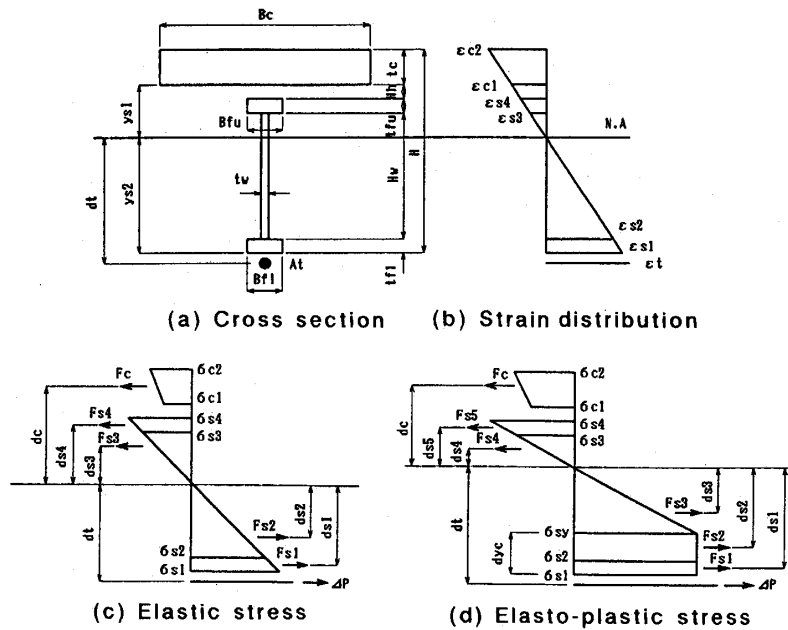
Strain Distribution and Stress Condition in the Prestressed Composite Girder Cross Section
